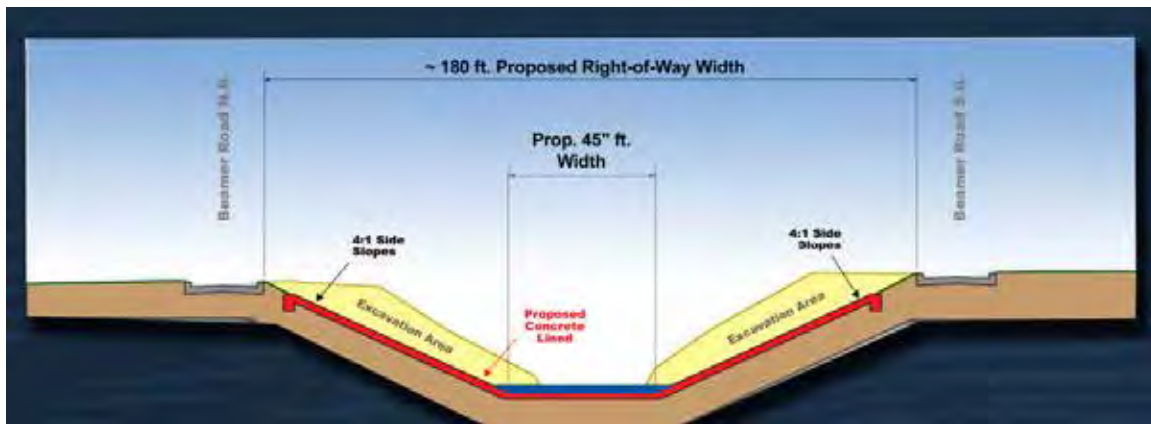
Mud Gully Conveyance Measure Cross Section
